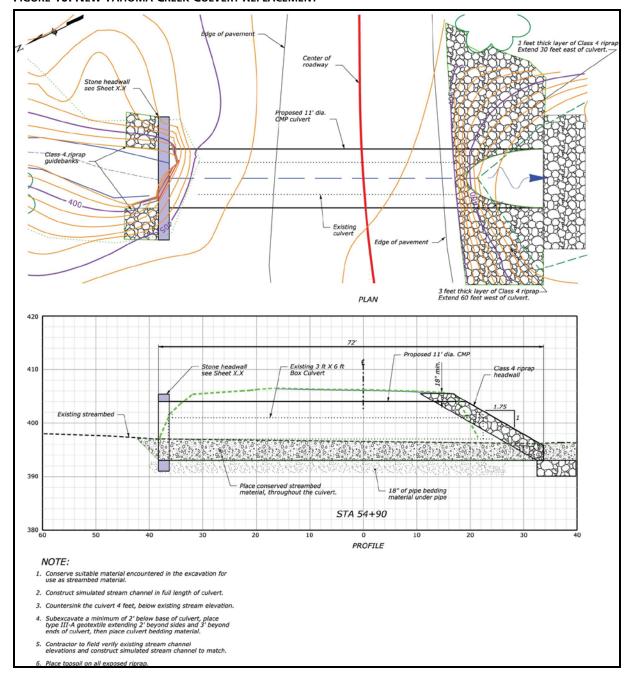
NEW TAHOMA CREEK CULVERT REPLACEMENT
